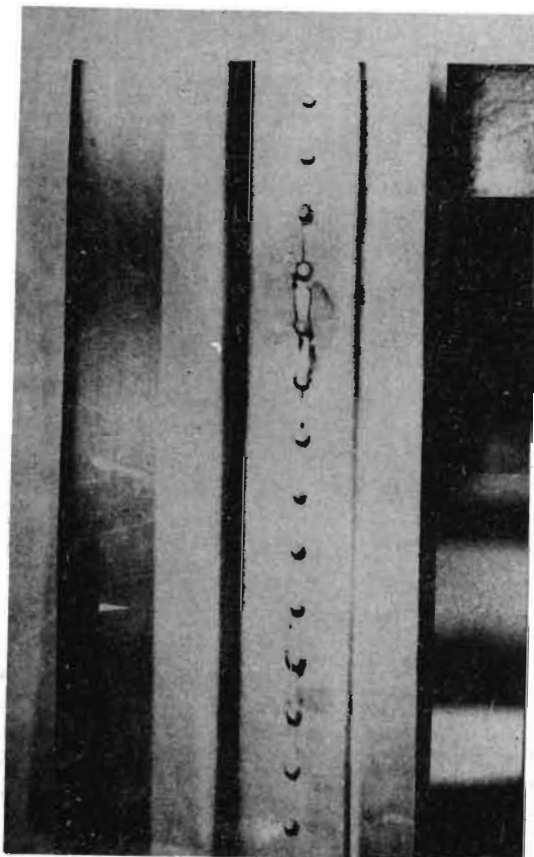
Typical pattern of a crack in the top plate of a stiffener.
